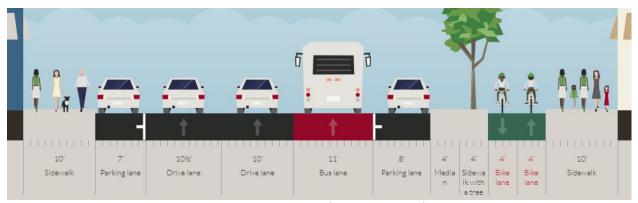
Typical Cross Section of Folsom Street between 8th and between 6th streets, looking east
